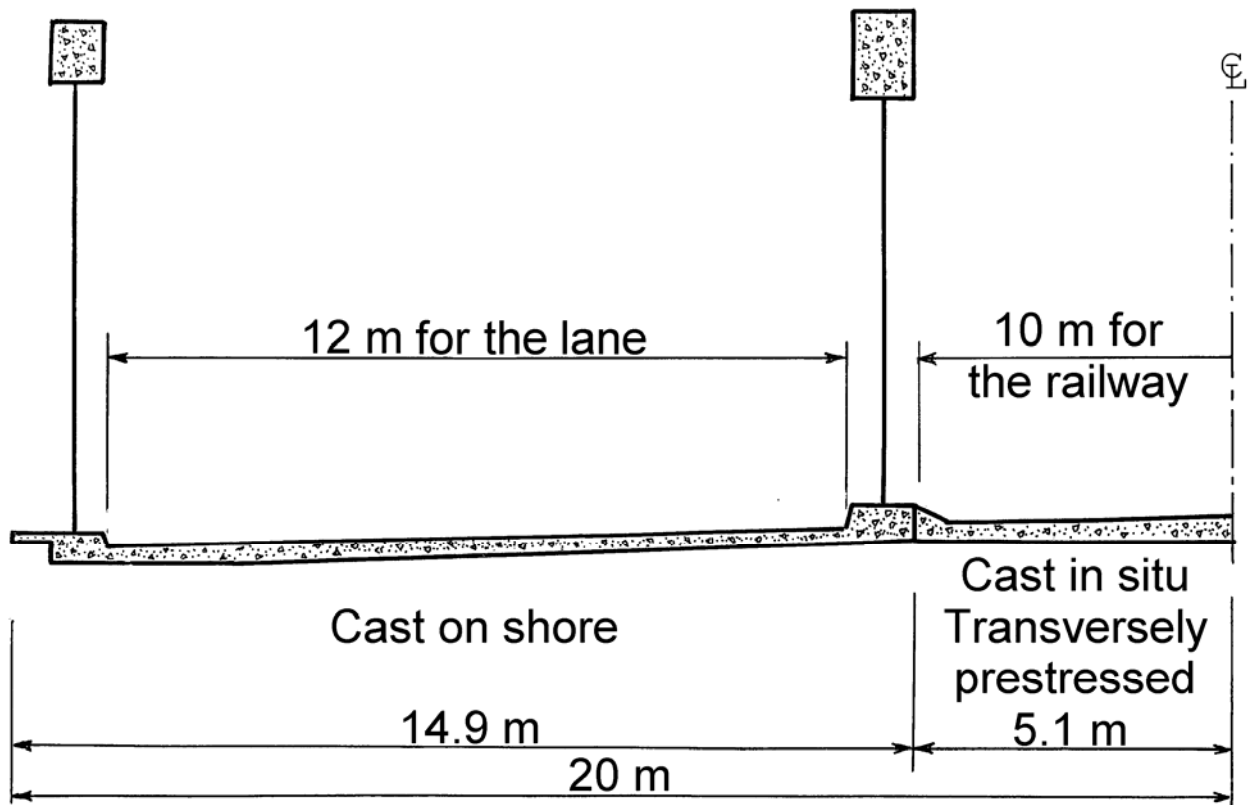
Cross-section through half a network arch with a span of 215 metres. Tveit 1999.
